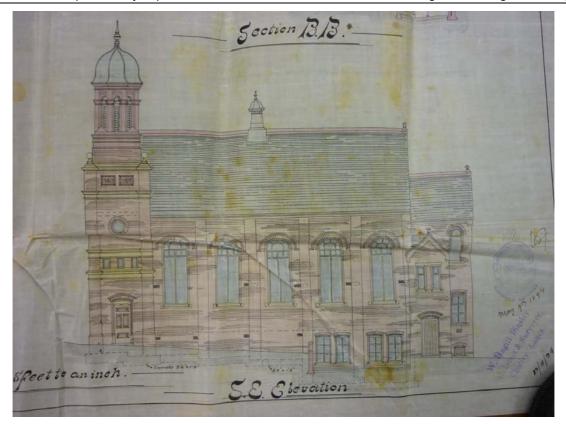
Proposed south-east elevation (CRO(B) Building Control 3237 1894)
